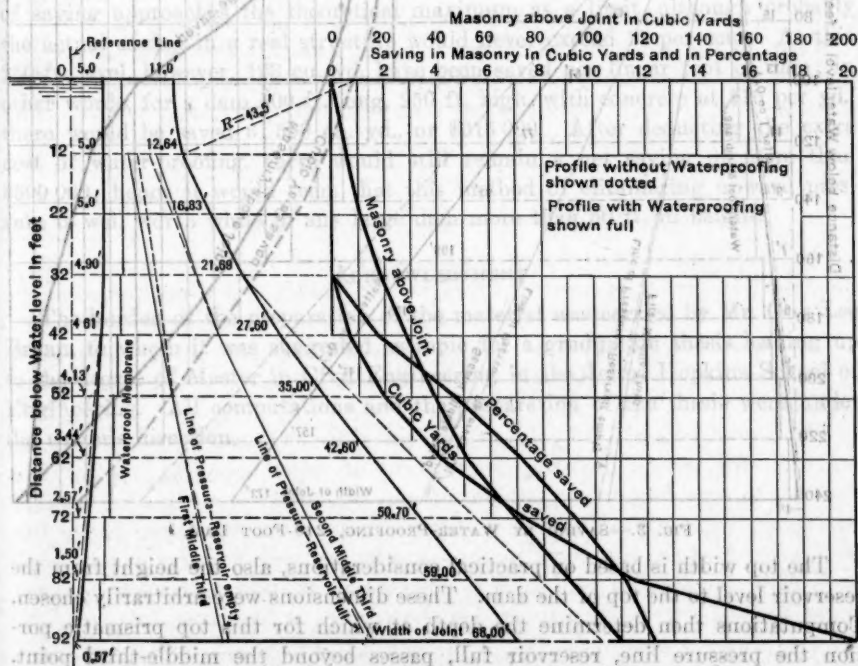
SAVING BY WATER-PROOFING, 92-FOOT DAM.
